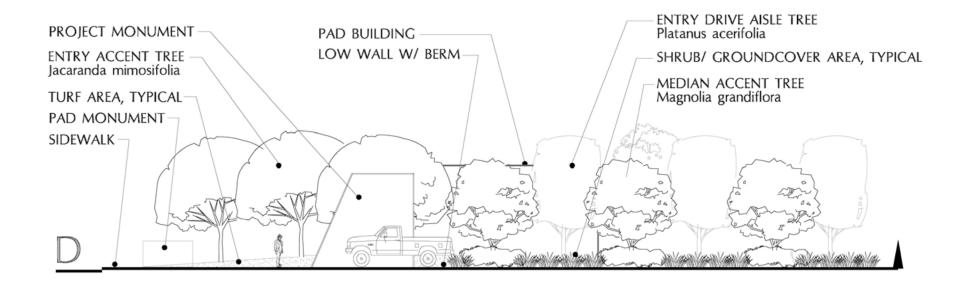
F SPECIAL LANDSCAPE TREATMENT SECTION
